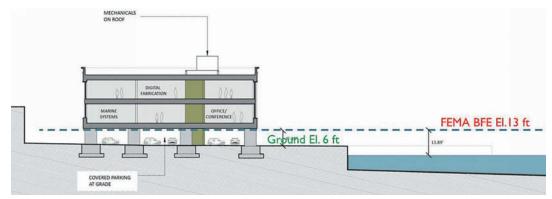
THIS SECTION THROUGH IYRS SHOWS HOW THE HABITABLE AREAS OF THE STRUCTURE, THE FLOOR STRUCTURE ITSELF, THE MECHANICAL SYSTEMS, MACHINE ROOMS AND EQUIPMENT ARE ELEVATED ABOVE THE FEMA BASE FLOOD ELEVATION (BFE). THE COVERED AREA UNDER THE STRUCTURE CAN BE USED FOR PARKING. THE CONCRETE AND STEEL STRUCTURE IS DESIGNED SPECIFICALLY TO WITHSTAND WAVE ACTION, WITH FOUNDATIONS SIZED AND PLACED TO RESIST THE EROSION-LIKE EFFECTS OF SCOUR FOLLOWING A STORM SURGE EVENT. PHOTO CREDIT: WILSON ARCHITECTS.
